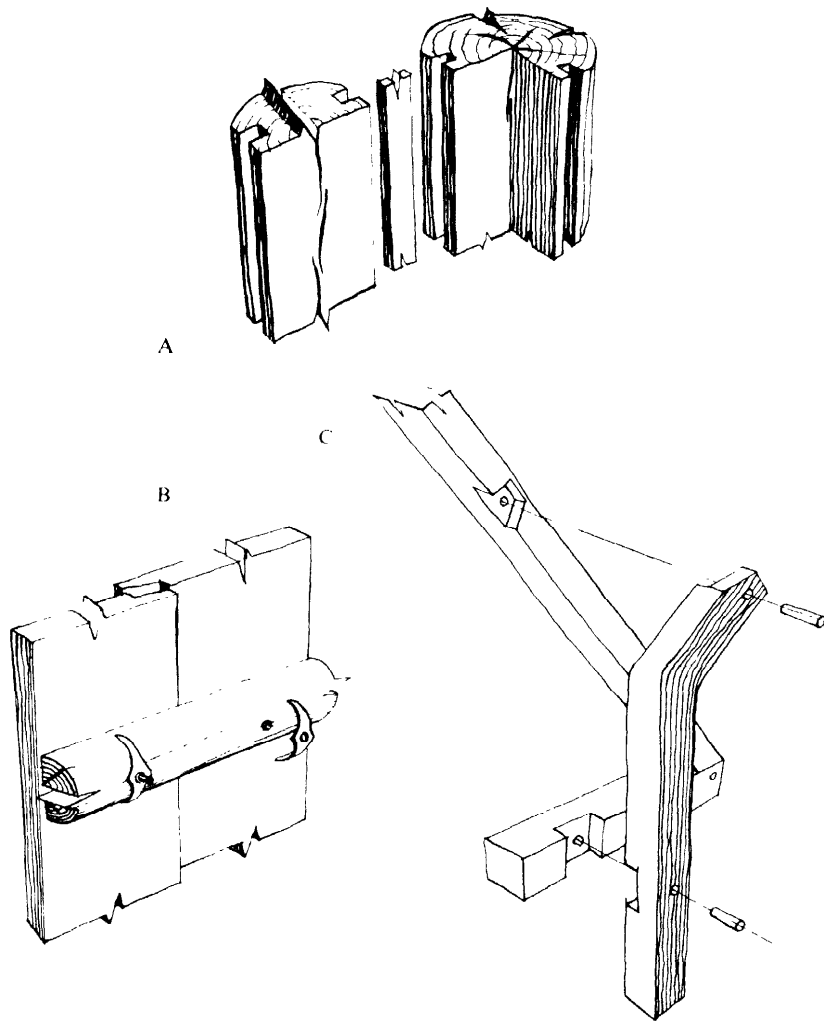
A Cross-section of circular posts, Greensted-juxta-Ongar church; B Detail of the door, Hadstock church; C Squint lap-joints, Sompting church, Sussex
